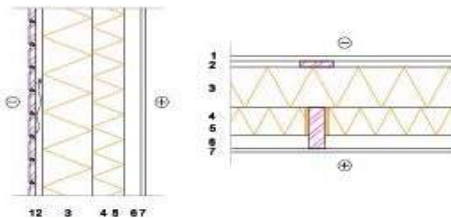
ZEB wall composition: 1 – gel coating; 2 –ventilated gap; 3 –slab SPU AL 150 mm; 4 –slab SPU AL 100 mm; 5 – rack wooden frame; 6 –space for laying of engineering communications; 7 –interior finishing layer.
